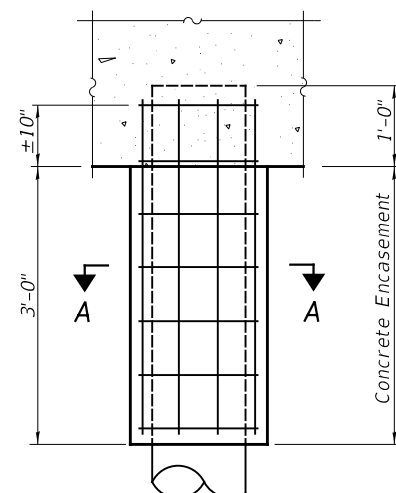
DETAIL OF CYLINDRICAL STEEL SHELL FOR CAST IN PLACE CONCRETE PILES
